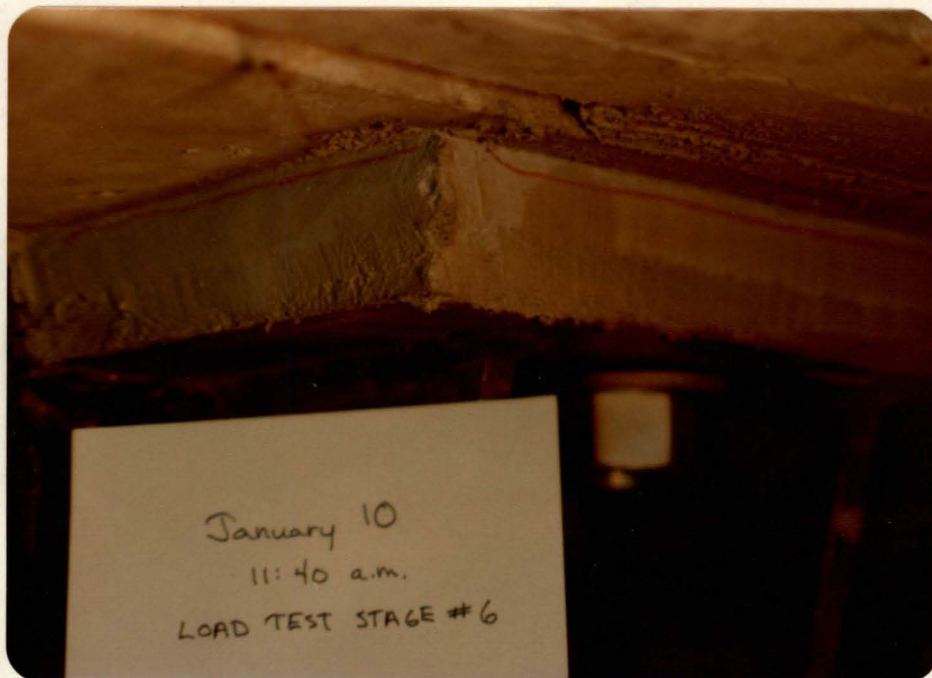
Bottom-View of Shelf Exhibiting Hairline, Flexural Crack - Typical
